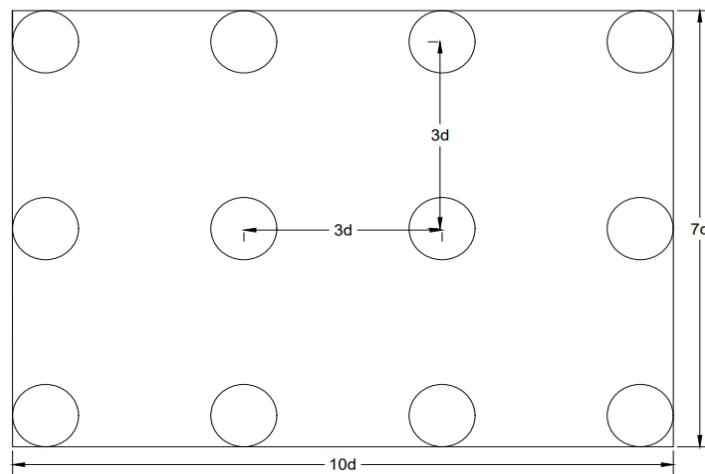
12 pile arrangement with 70 sqm. Raft size
